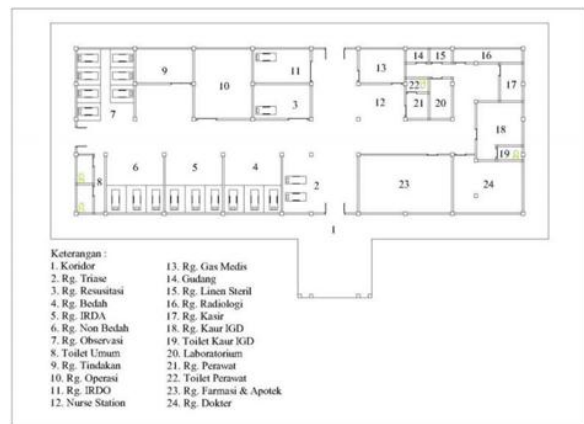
Floor Plan of RSUD Toto Kabila's Emergency Room
